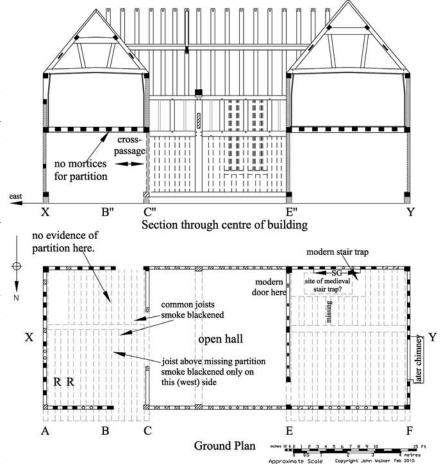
Plan and long section of Upper Town Cottage, Nazeing, Essex
